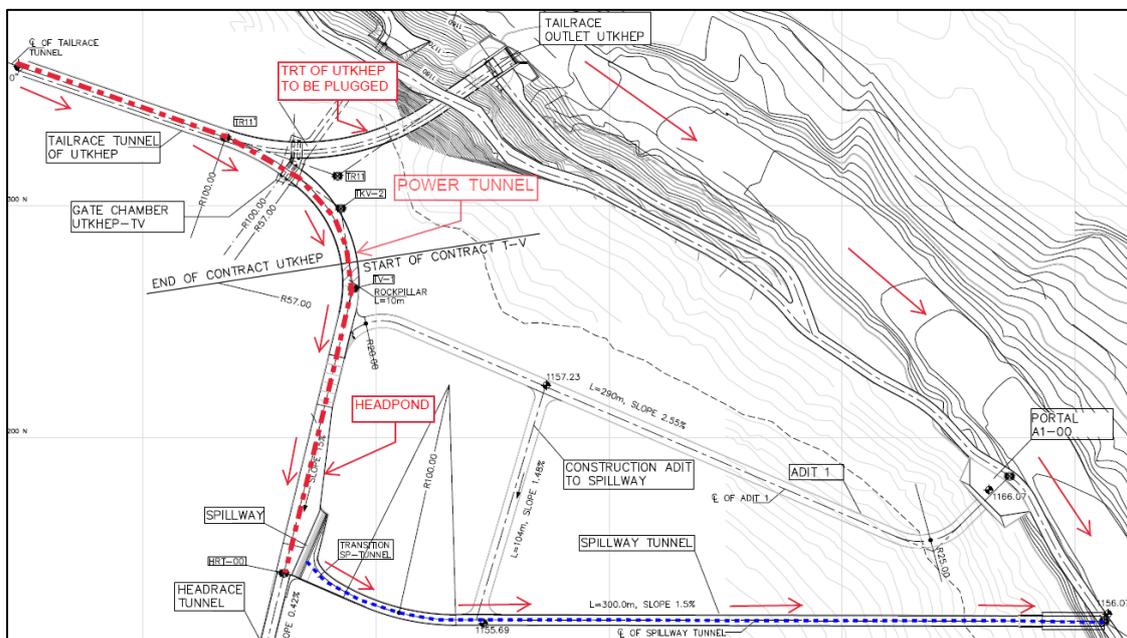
Sketch of the general layout plan of the headpond, the power tunnel, the side weir spillway, and the spillway tunnel of Tamakoshi-V HEP (not to scale)
